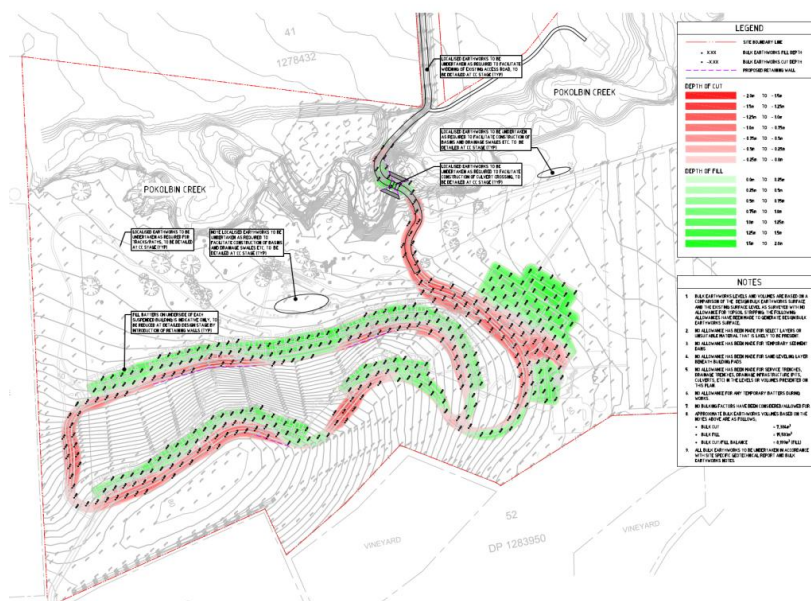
Preliminary Proposed Earthworks Plans (Extent of Cut and Fill)
